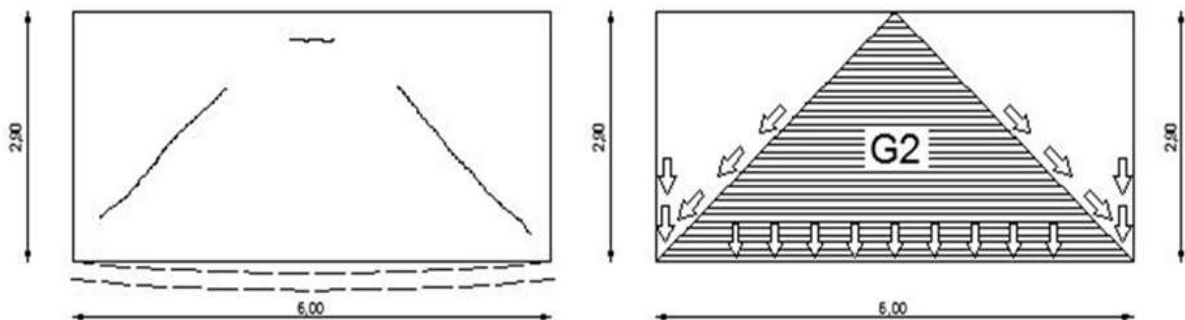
Cracks when deforming support beam of 6m. And creep loads.Loads calculation.
